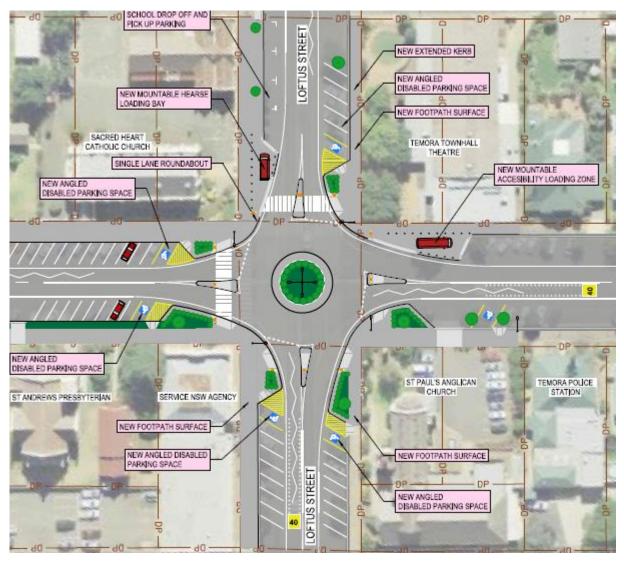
Update plan to show reduced size of kerb blisters and new parking area beside Catholic Church
